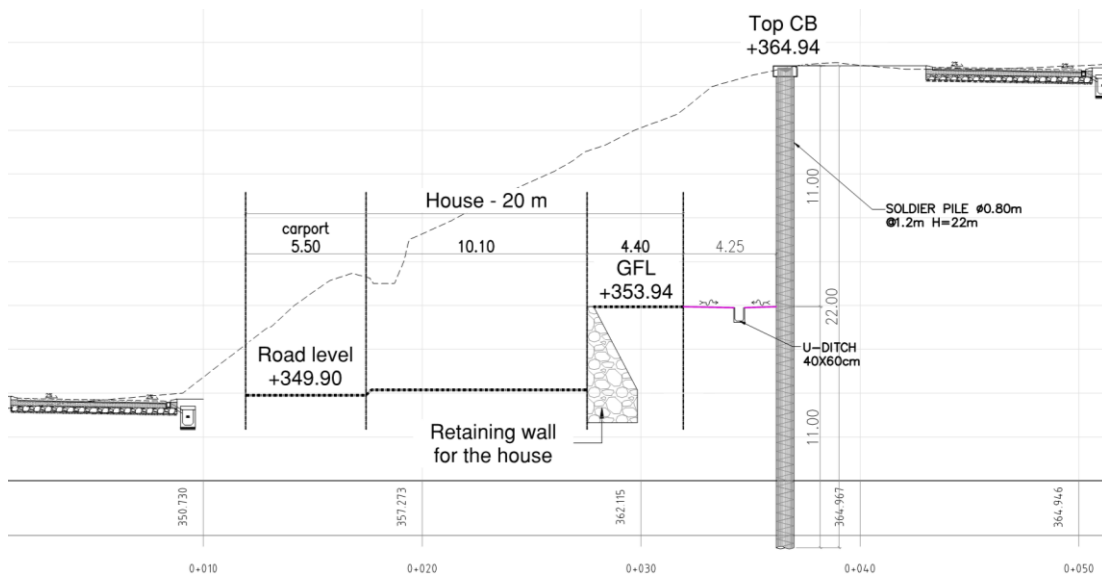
Cross section at the deepest excavation depth (cross section at inclino 2 in Figure 3)
